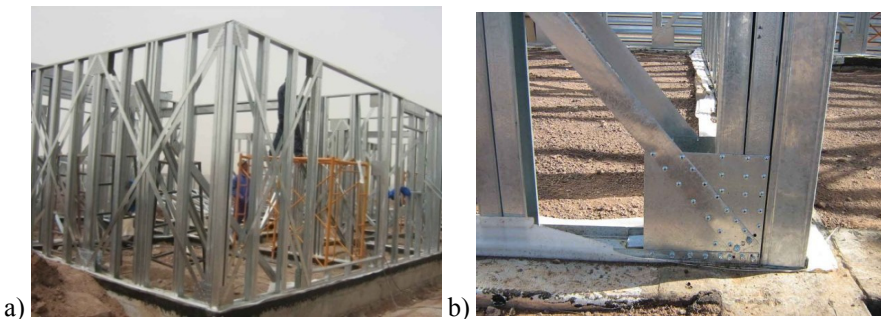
a) Wall lateral bracing with steel straps (X-bracings); b) Detail of the connection between diagonal strap and steel framing
